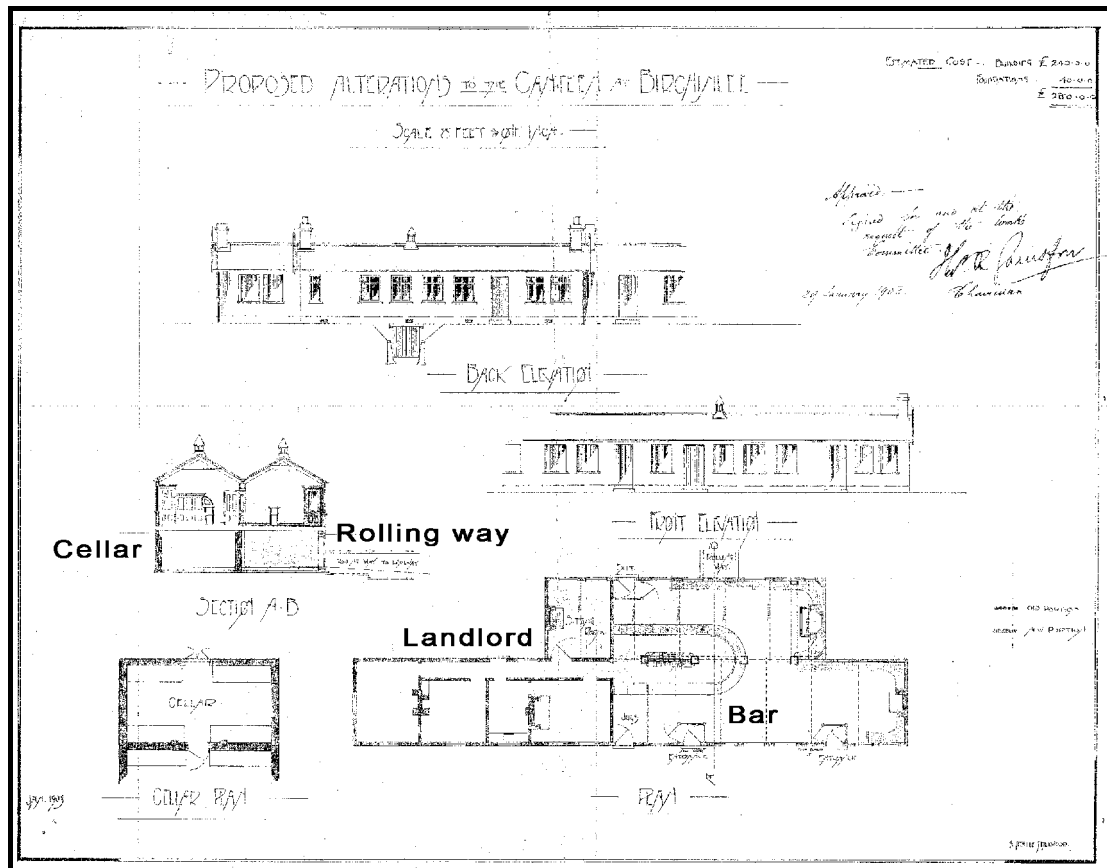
Plans and elevations of Derwent Canteen, Tin Town. From Stallwood 1903
